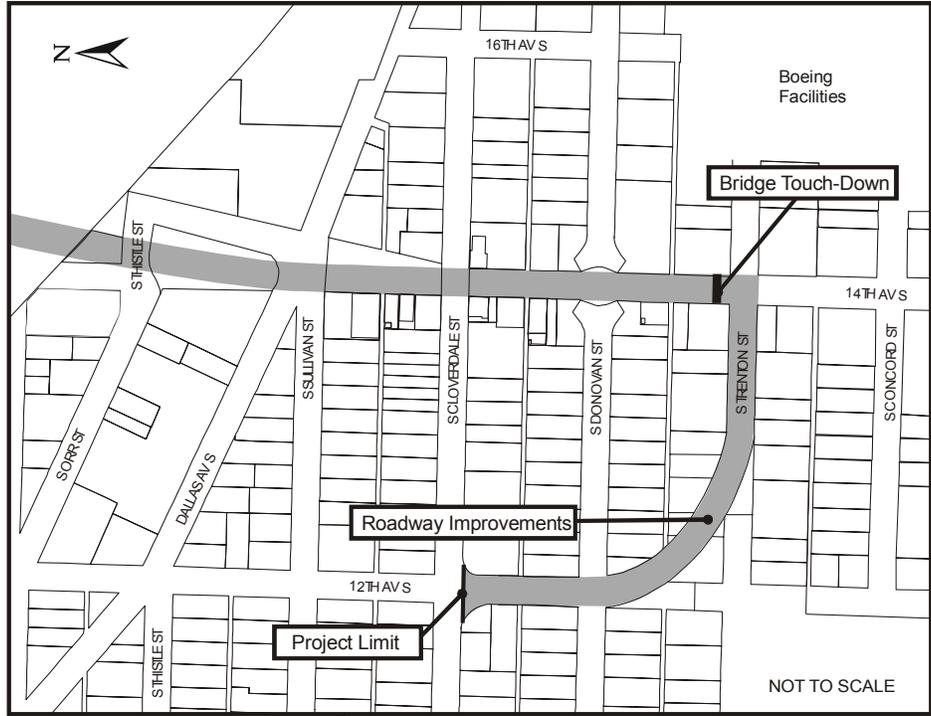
High-Level Fixed-Span Bridge Alternative Street Network
